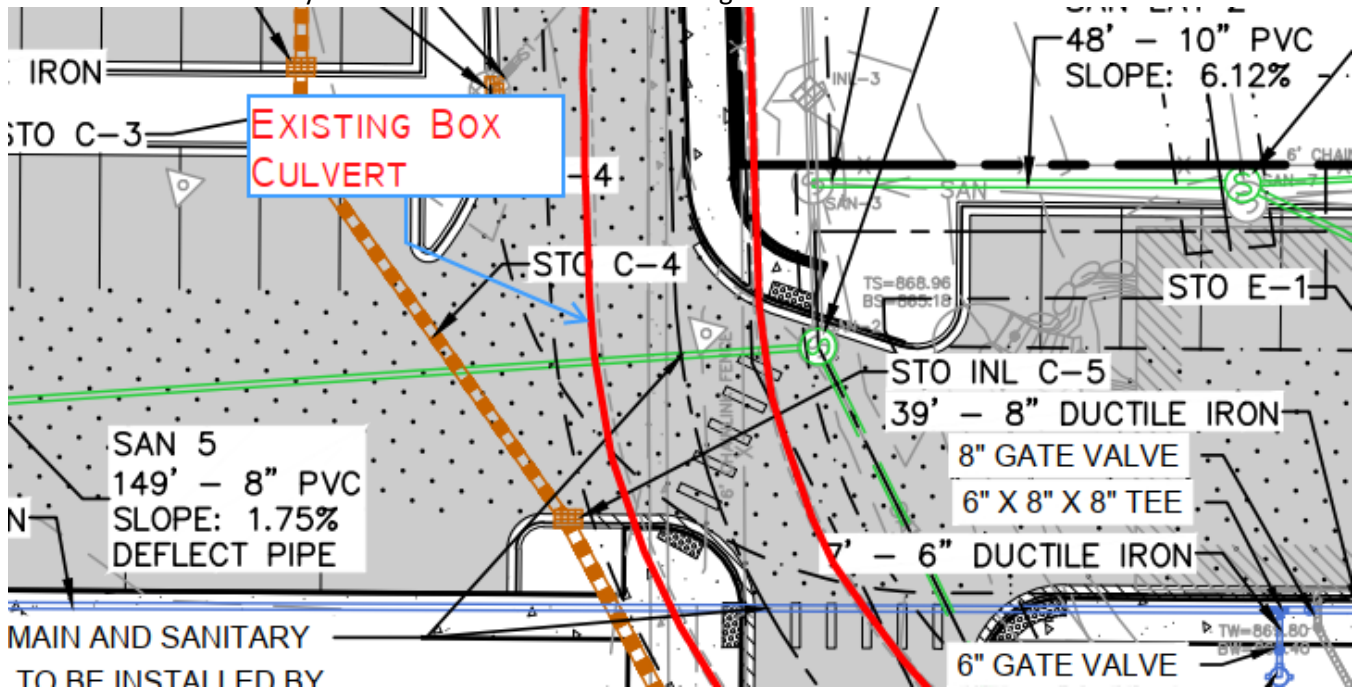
Figure A: Partial site plan showing location of sanitary line and existing box culvert.
